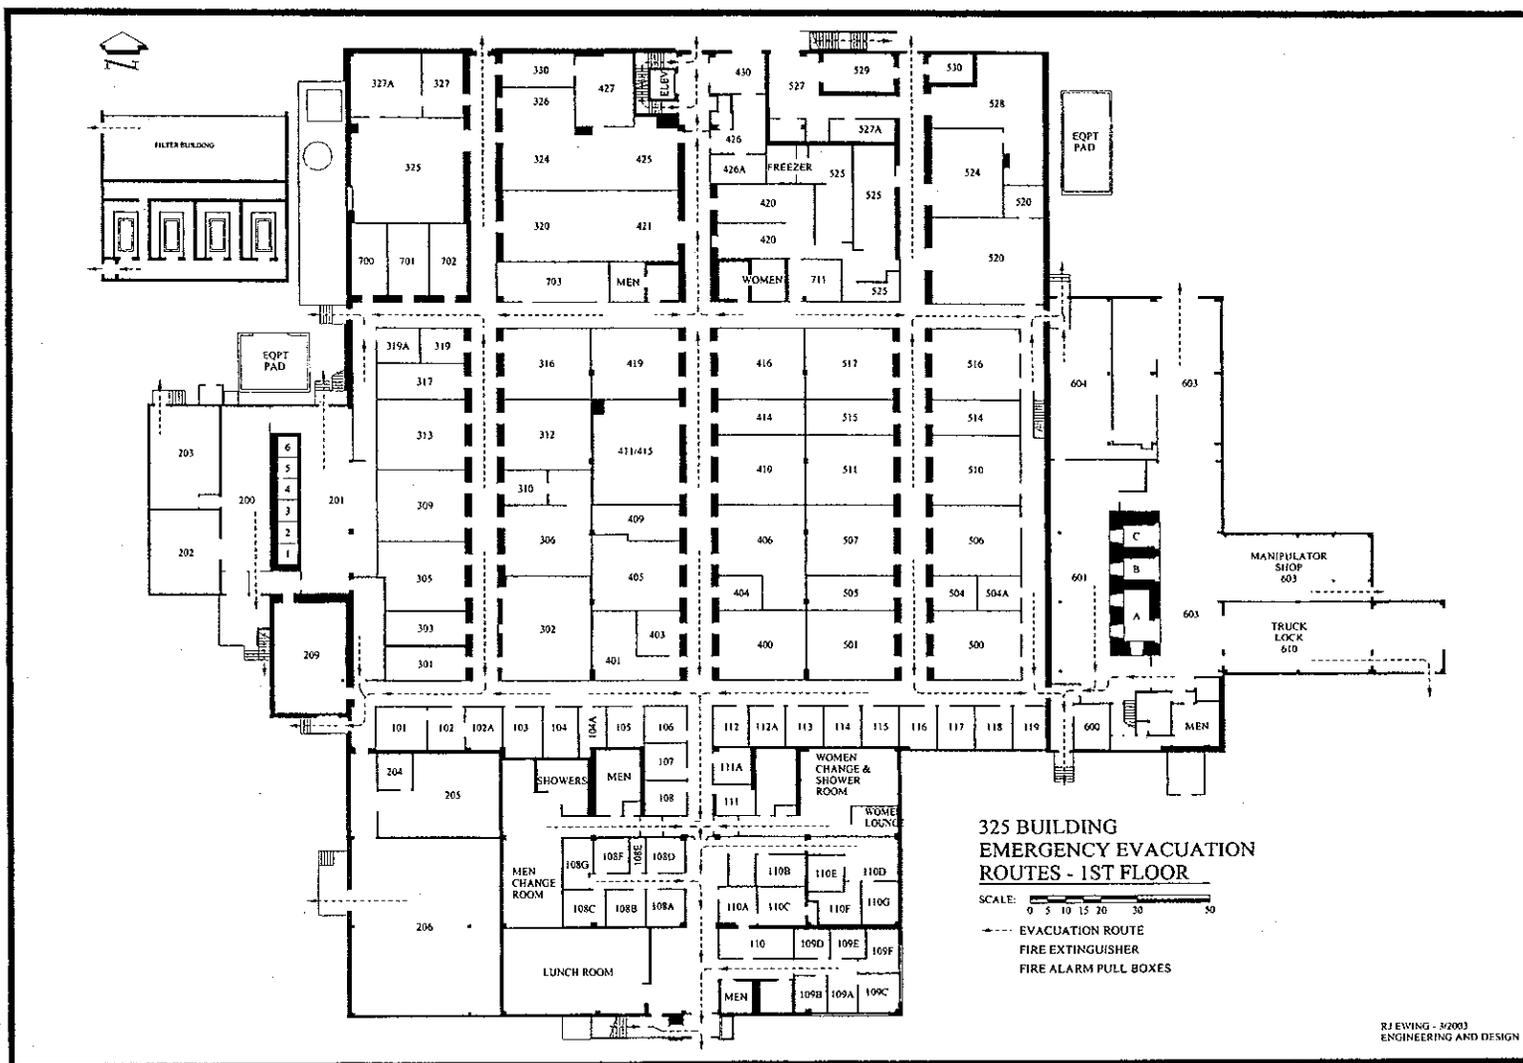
Emergency Equipment Locations - 1st Floor
